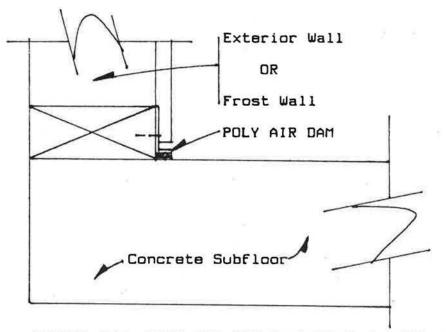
POLY AIR DAM installed at sill plate on concrete subfloor.
